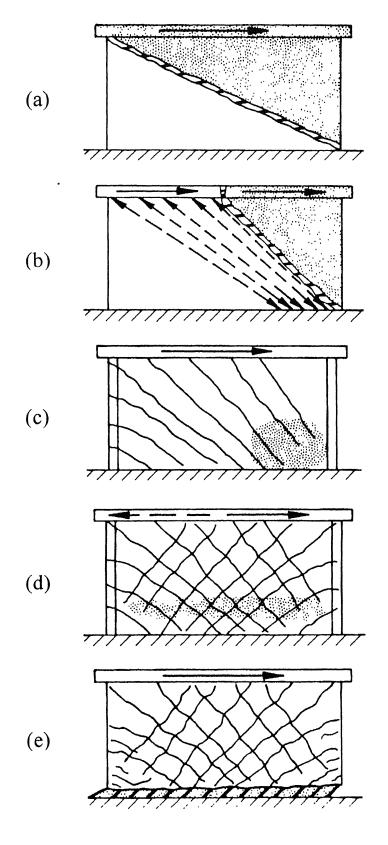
Failure modes in squat structural walls (a) Diagonal tension failure (b) Diagonal tension crack along a steeper plane (c) Diagonal compression failure (d) Spread of crushing of concrete over the entire length of wall (e) Sliding-shear failure (from Paulay et al., 1982).
